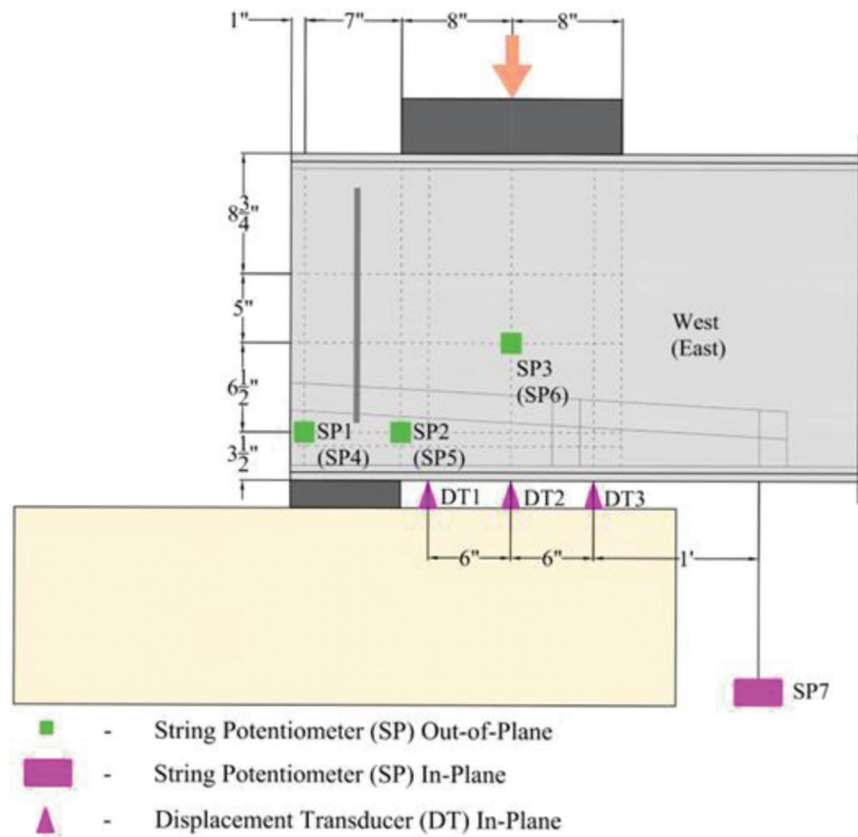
Displacement sensor layout (side elevation): Specimen 2.
